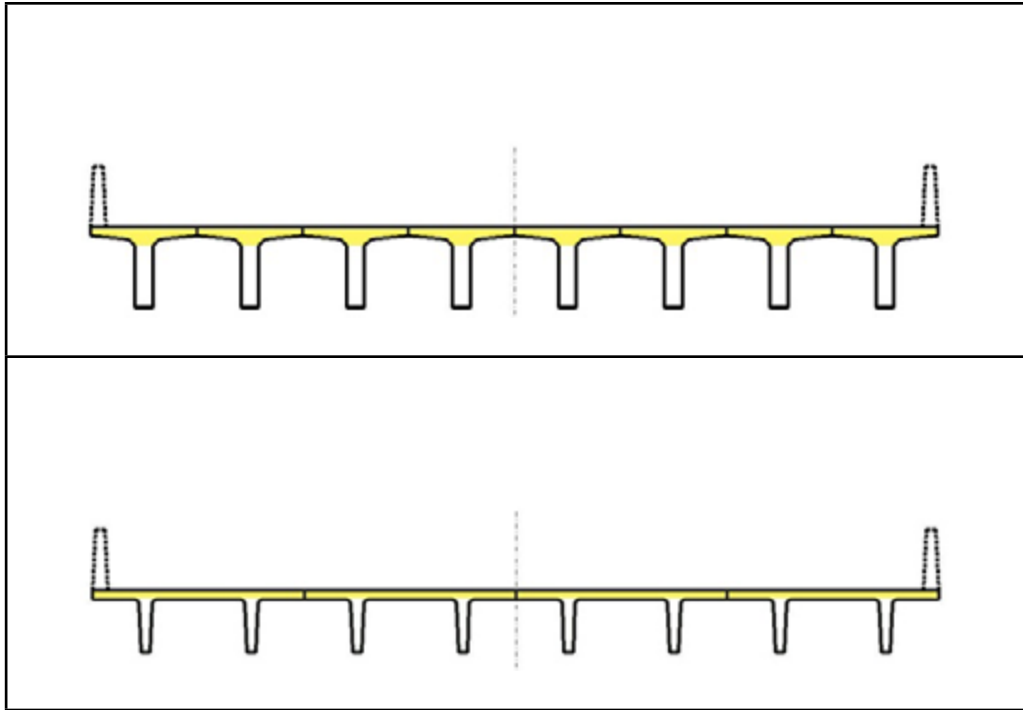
Prestressed Concrete Top Flange (Highlighted)
